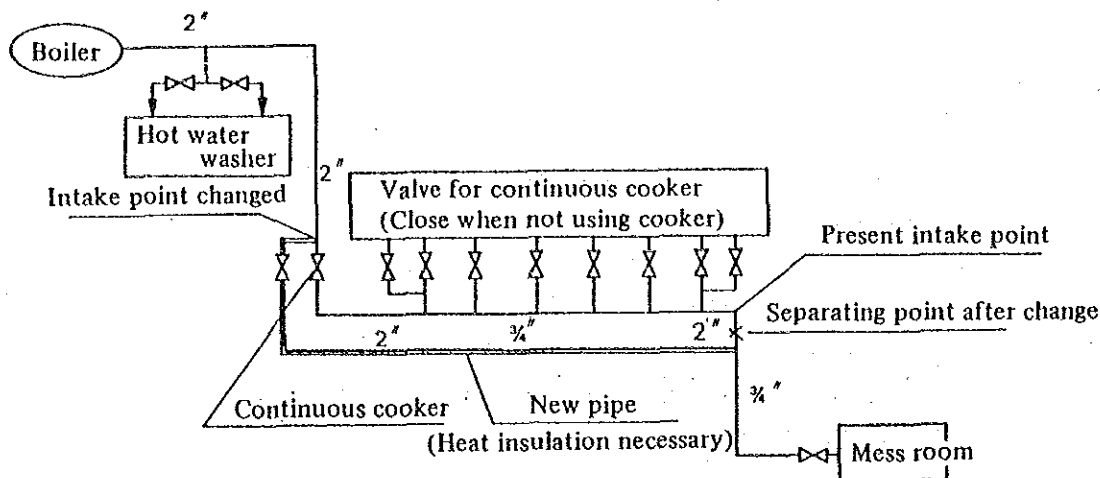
Improvement Procedure for Steam Piping to Mess Room Equipment
